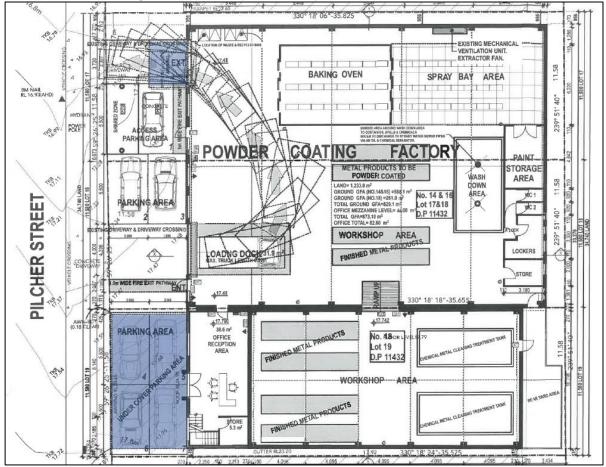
Layout of the ground floor as approved under the original consent (DA2017/051) including car parking area within the front setback.
